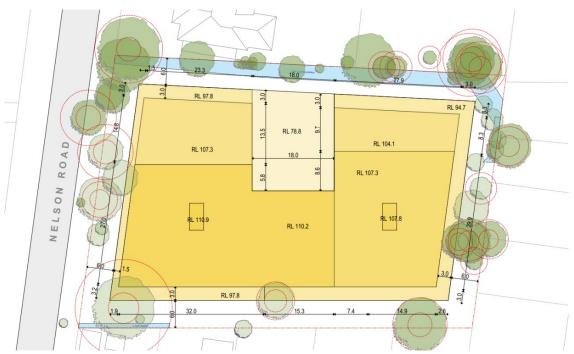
Extract of proposed Envelope Plan, showing the overall footprint of the development. *Source: DKO, 2025, drawing number DA104.
